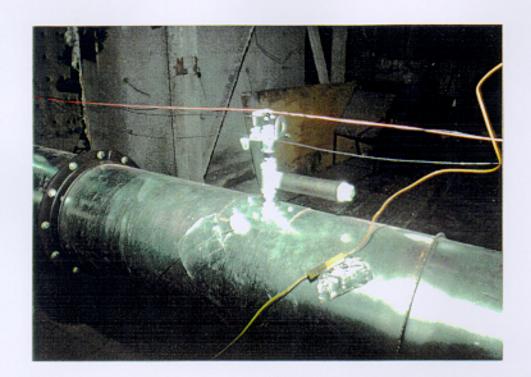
Task 2: Test set-up showing Pressure switch Assembly for Sprinkler at position No.6.
